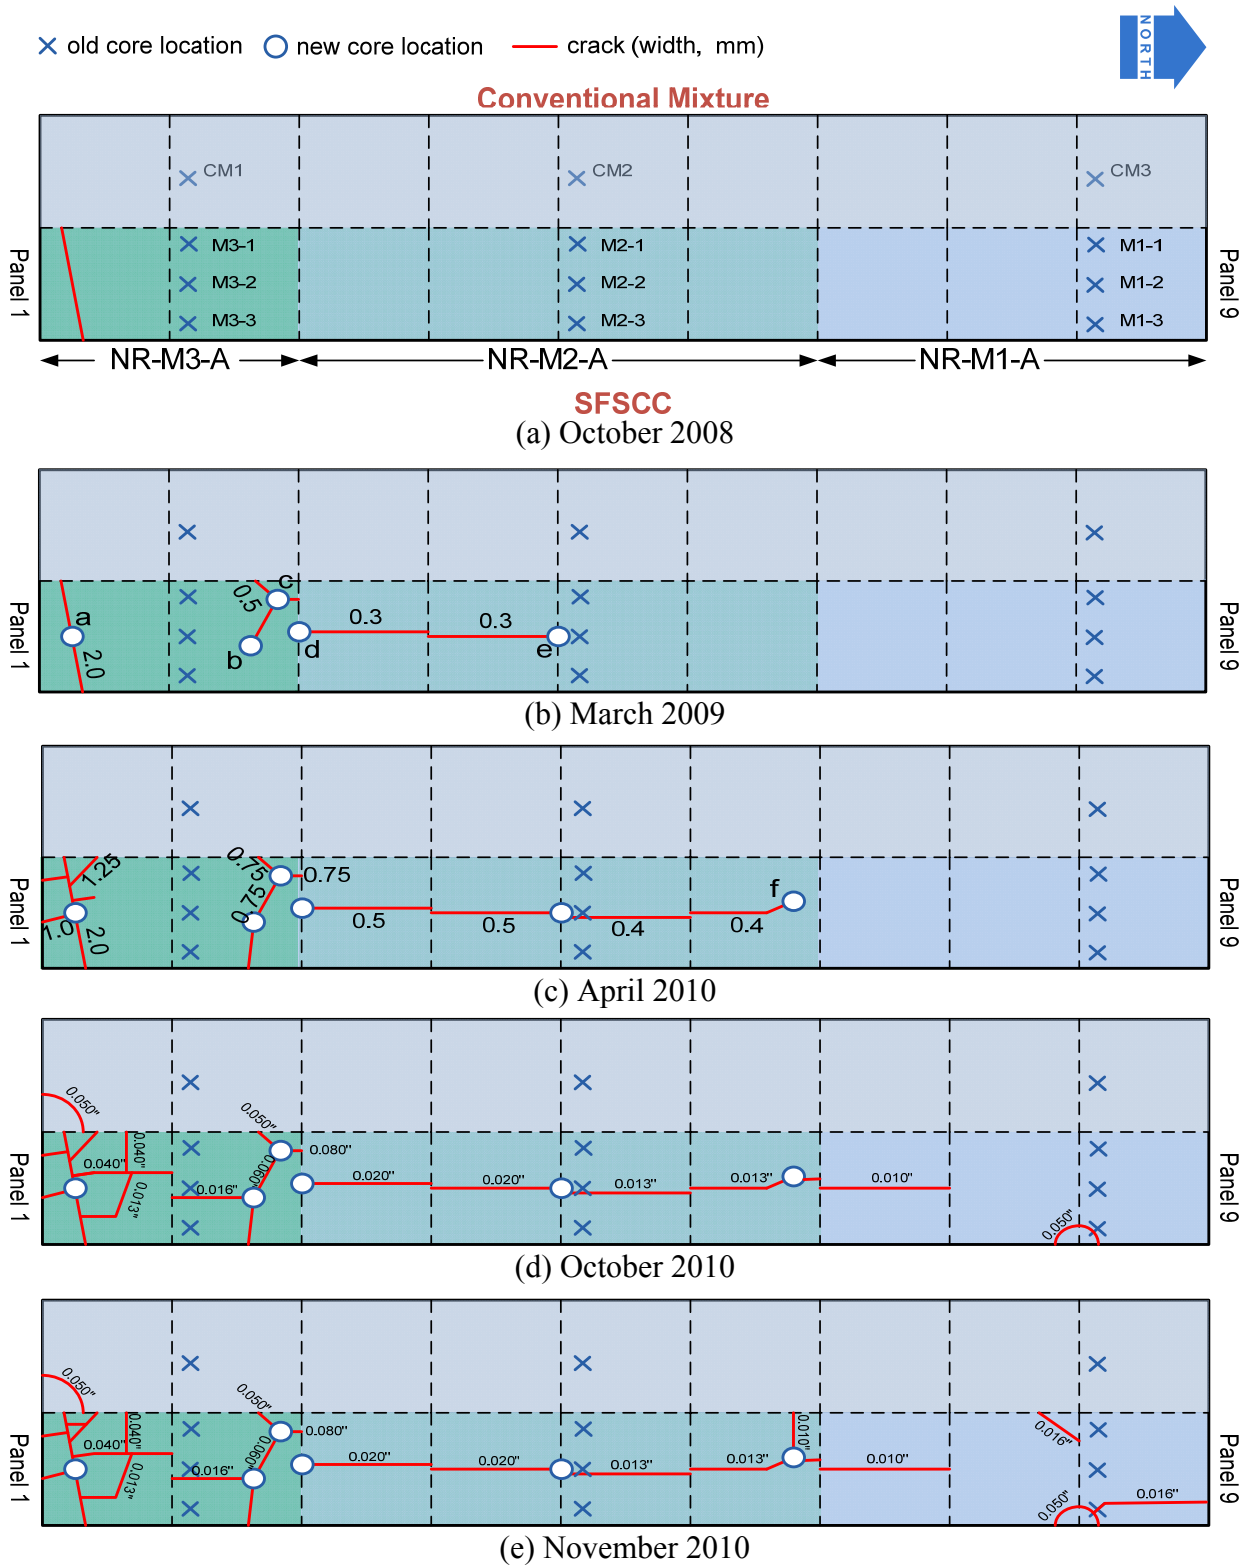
North Riverside Drive SFSCC pavement crack evolution
